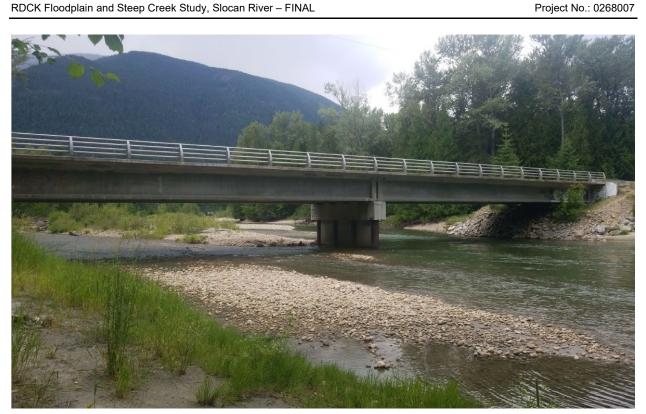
Little Slocan Bridge over the Little Slocan River from right bank looking upstream. Photo: Midwest Survey July 8, 2019.
